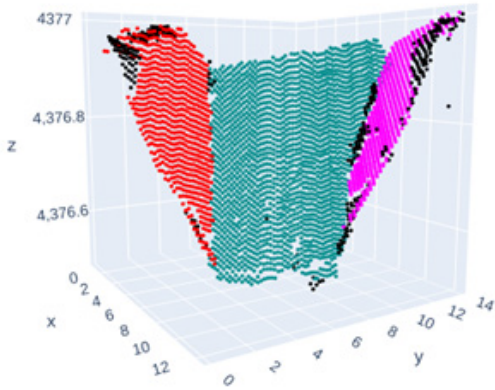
Upon segmentation of the ramp, individual ramp planes (left and right flares as well as the main ramp) are extracted.
